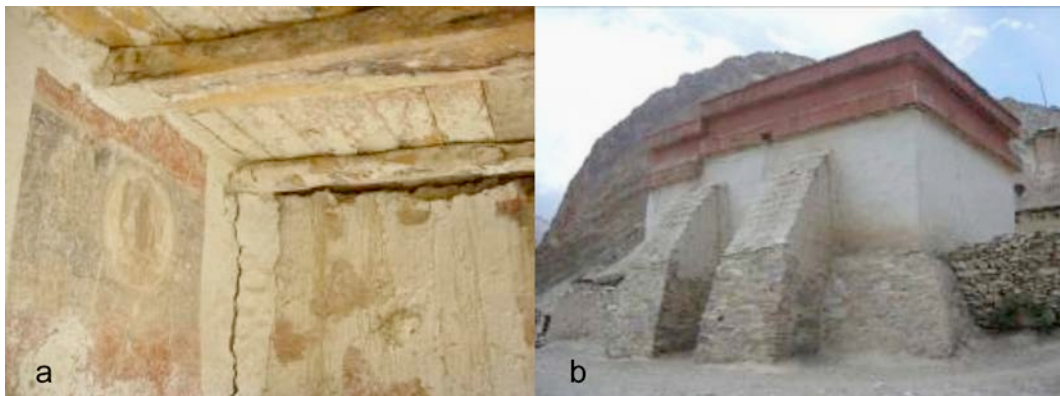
Kanji, Ladakh: conservation of the *Tsuglag-Khang*; (a) the interior damaged paintings; (b) the second roof, the stone buttress and the new foundations (credits: Mauro Bertagnin, 2007 (a); Giulia Bravo, 2008 (b))
